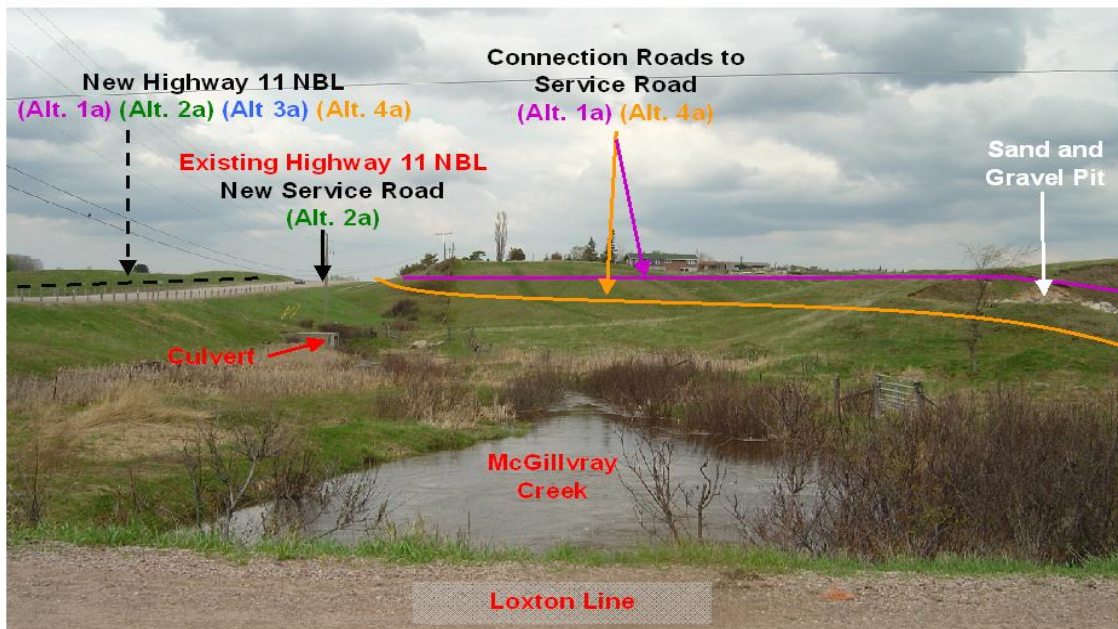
View looking south from north side of Loxton Line about 30 m east of Highway 11 NBL. Note McGillivray Creek floodplain. (May 8, 2007)
